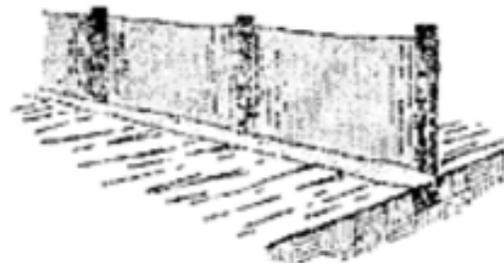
Constructing a silt fence to slow runoff and prevent erosion
